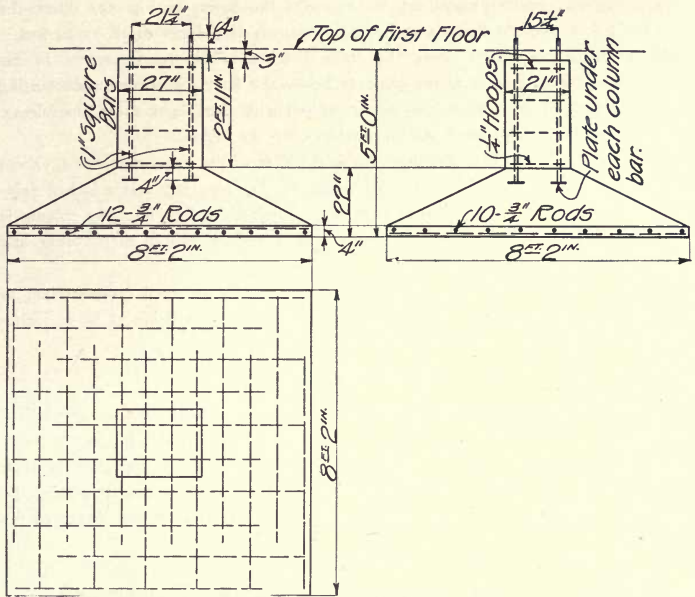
Reinforced Footings for Interior Columns. (See p. 93.)
